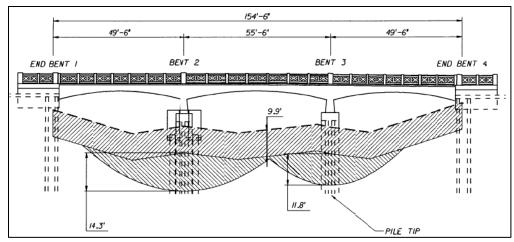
Venetian Causeway Bridge 11 (8DA14383), Elevation View
